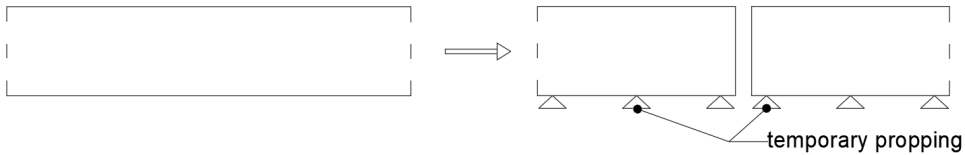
Sawing of a conventional concrete deck requires temporary propping
